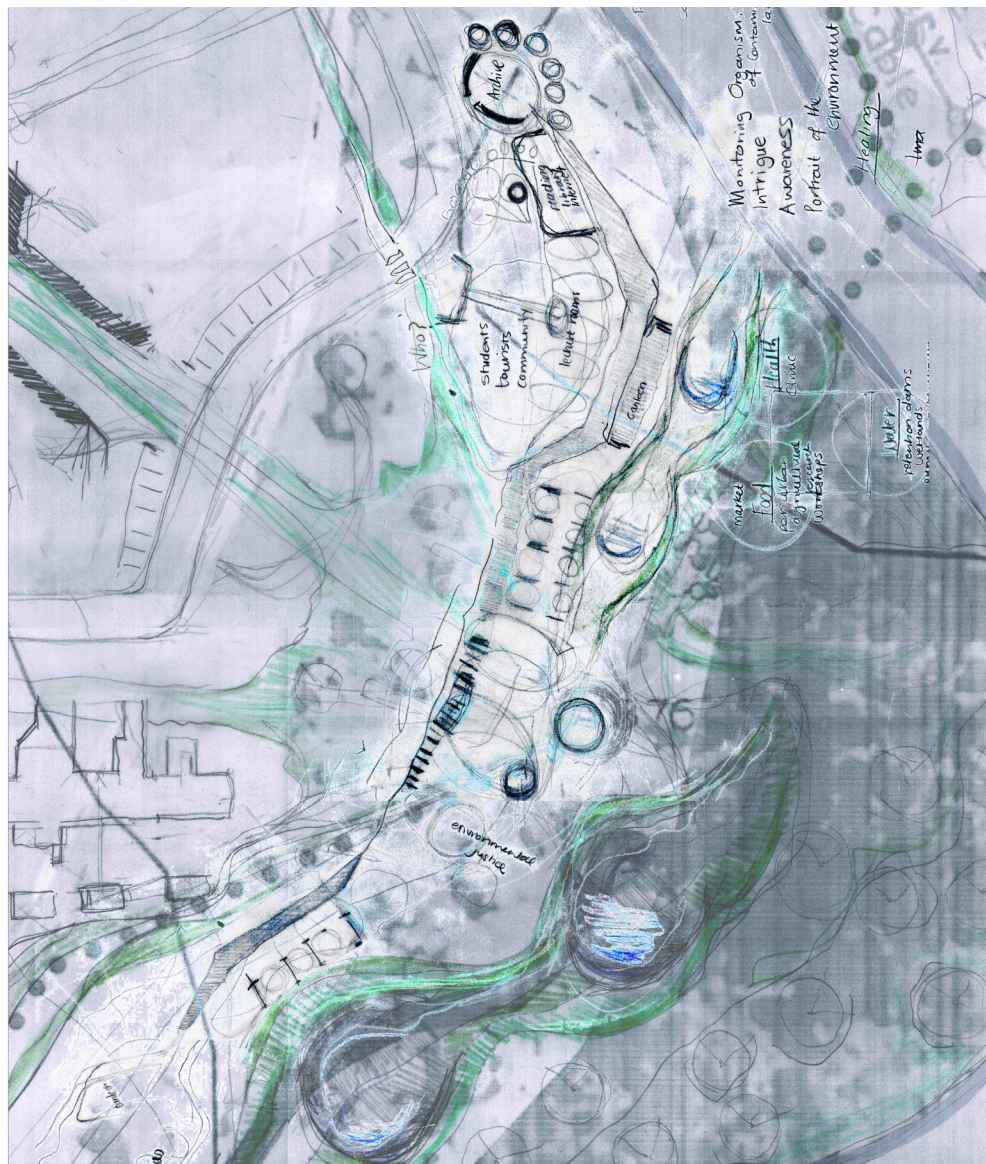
Site plan sketch responding to existing wetland. (Author, 2016)
